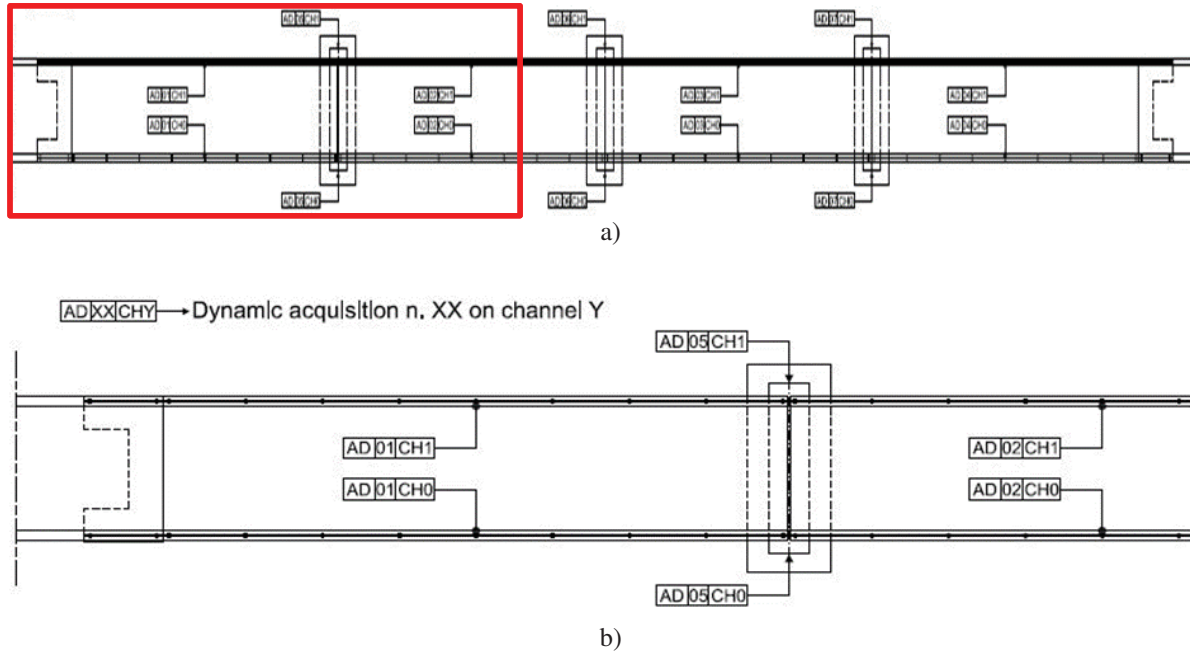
Position of the dynamic acquisitions: a) plan view of the whole bridge; b) detail of the first span.
